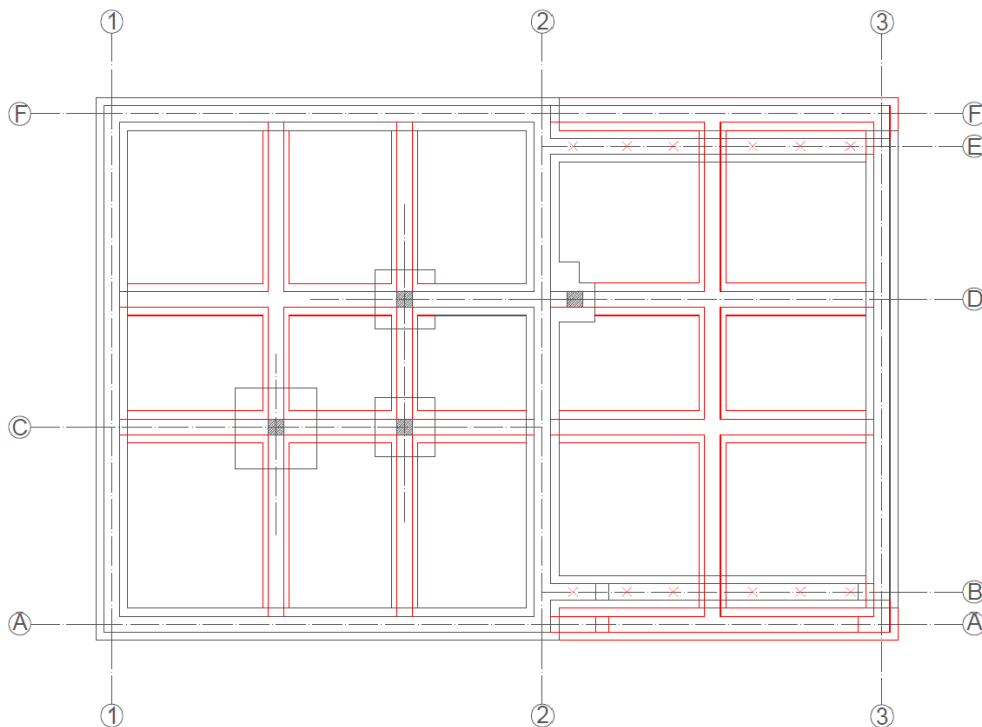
Scheme of the layout of the footings of the foundation gridded [own elaboration]
